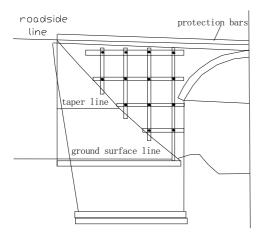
Layout of structural reinforcement using anchors/ties, Songjiagou Great Bridge
